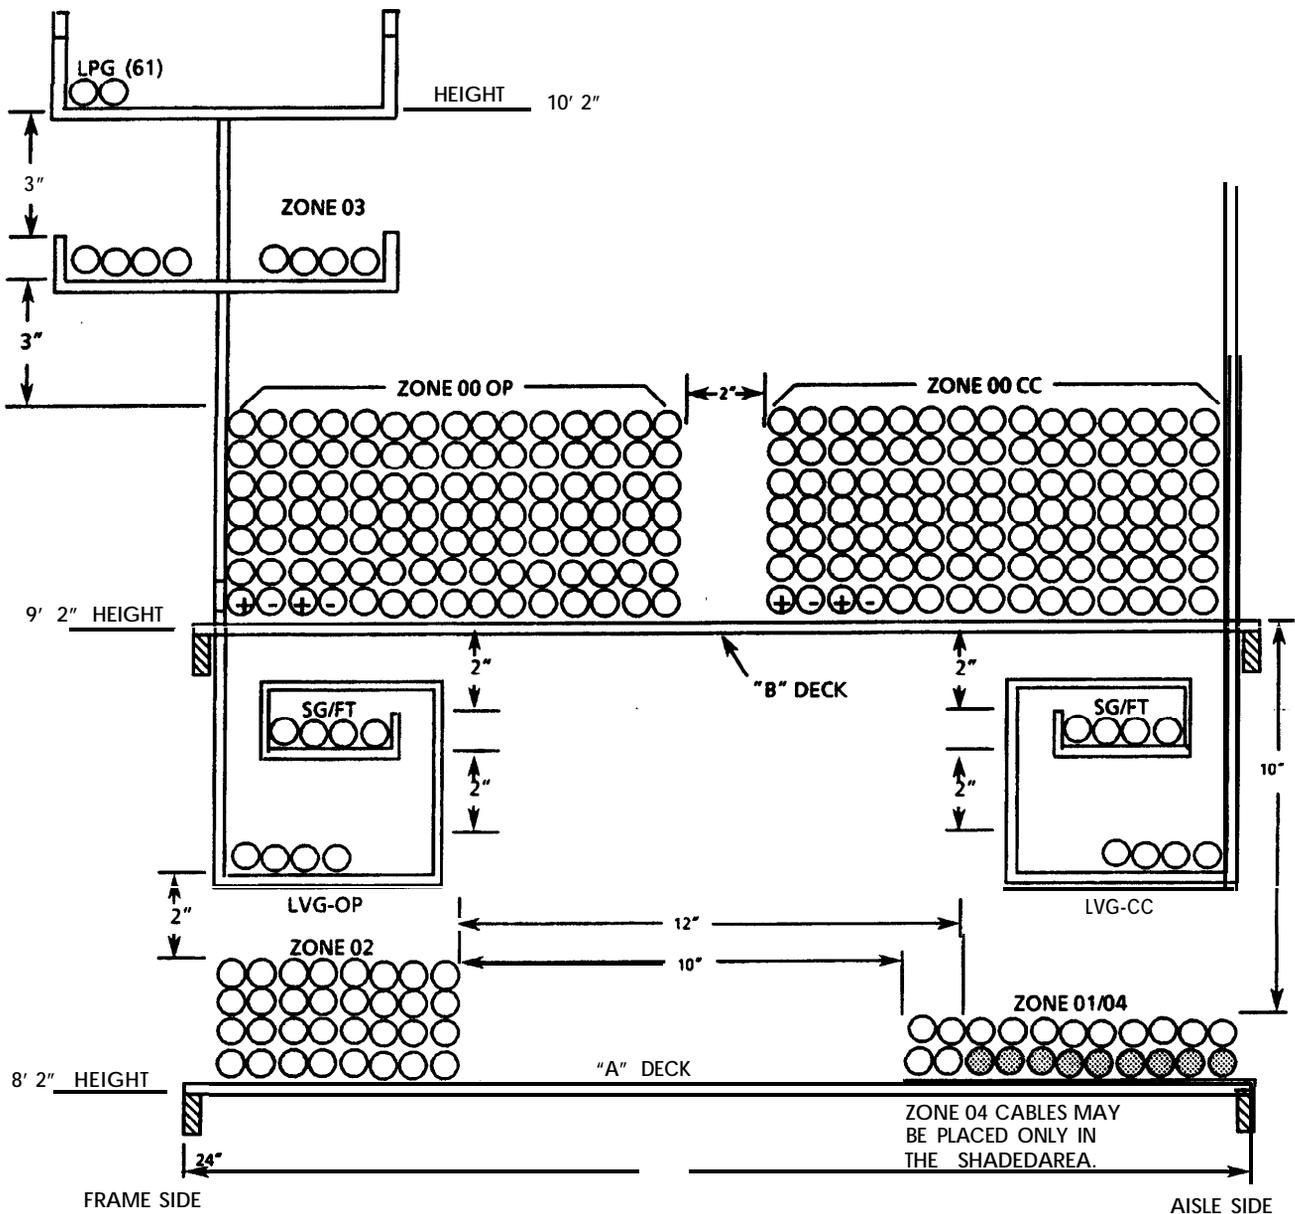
Typical GTD-5 EAX Main Aisle Runway (Ceiling Clearance At Least 10' 6").
